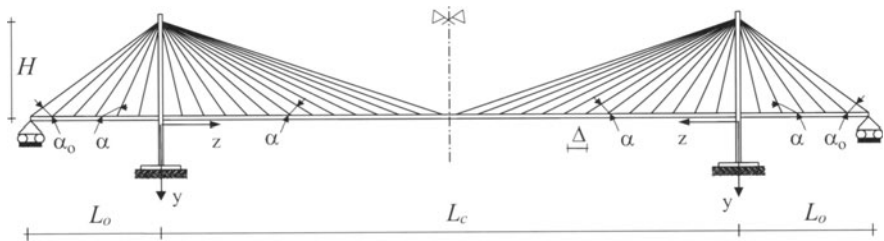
Fan-shaped cable-stayed bridge scheme: notations.
